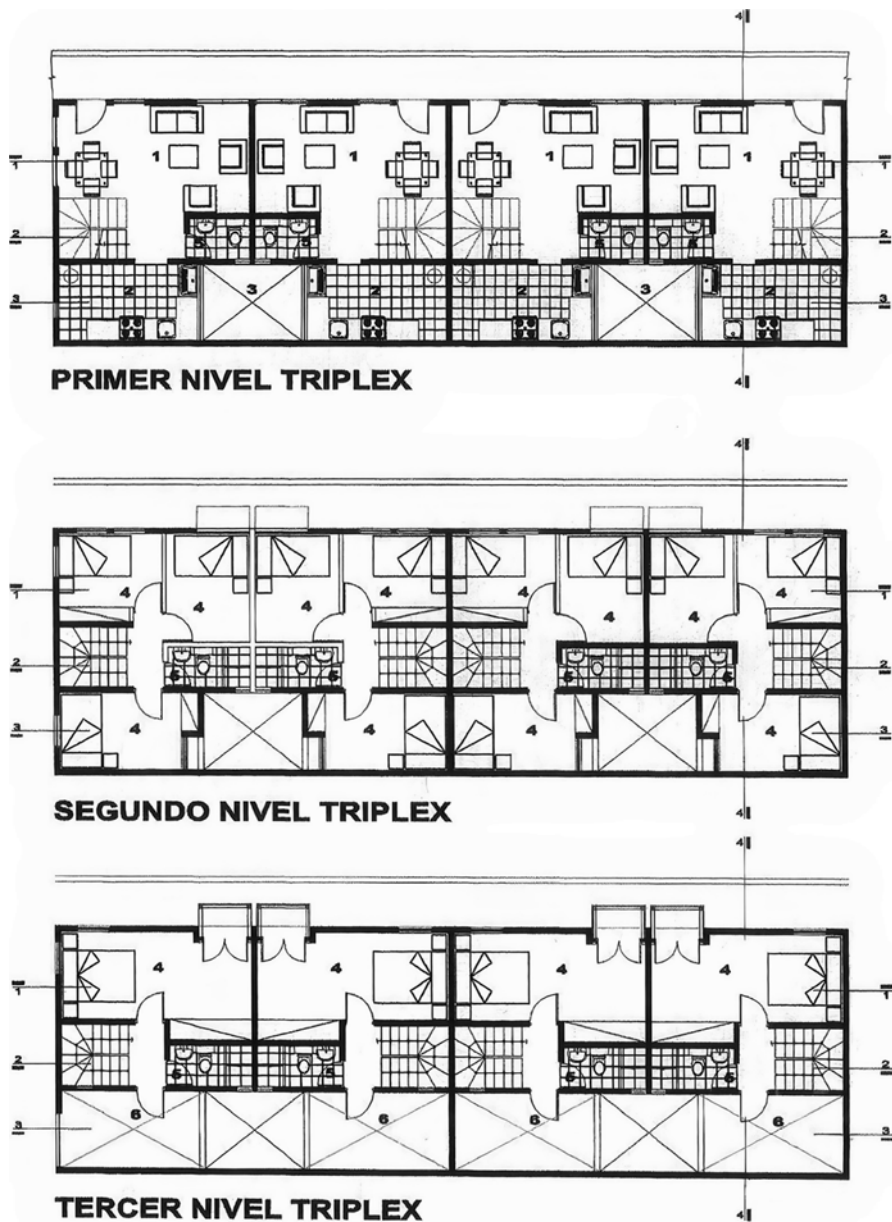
Triplex apartments floor plans of La Muralla Housing Complex. Source: Architect Luis Jiménez Campos Collection
